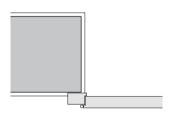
Frame clear of opening, fitted to either side of wall (internal and external doors) rebated door leaf
